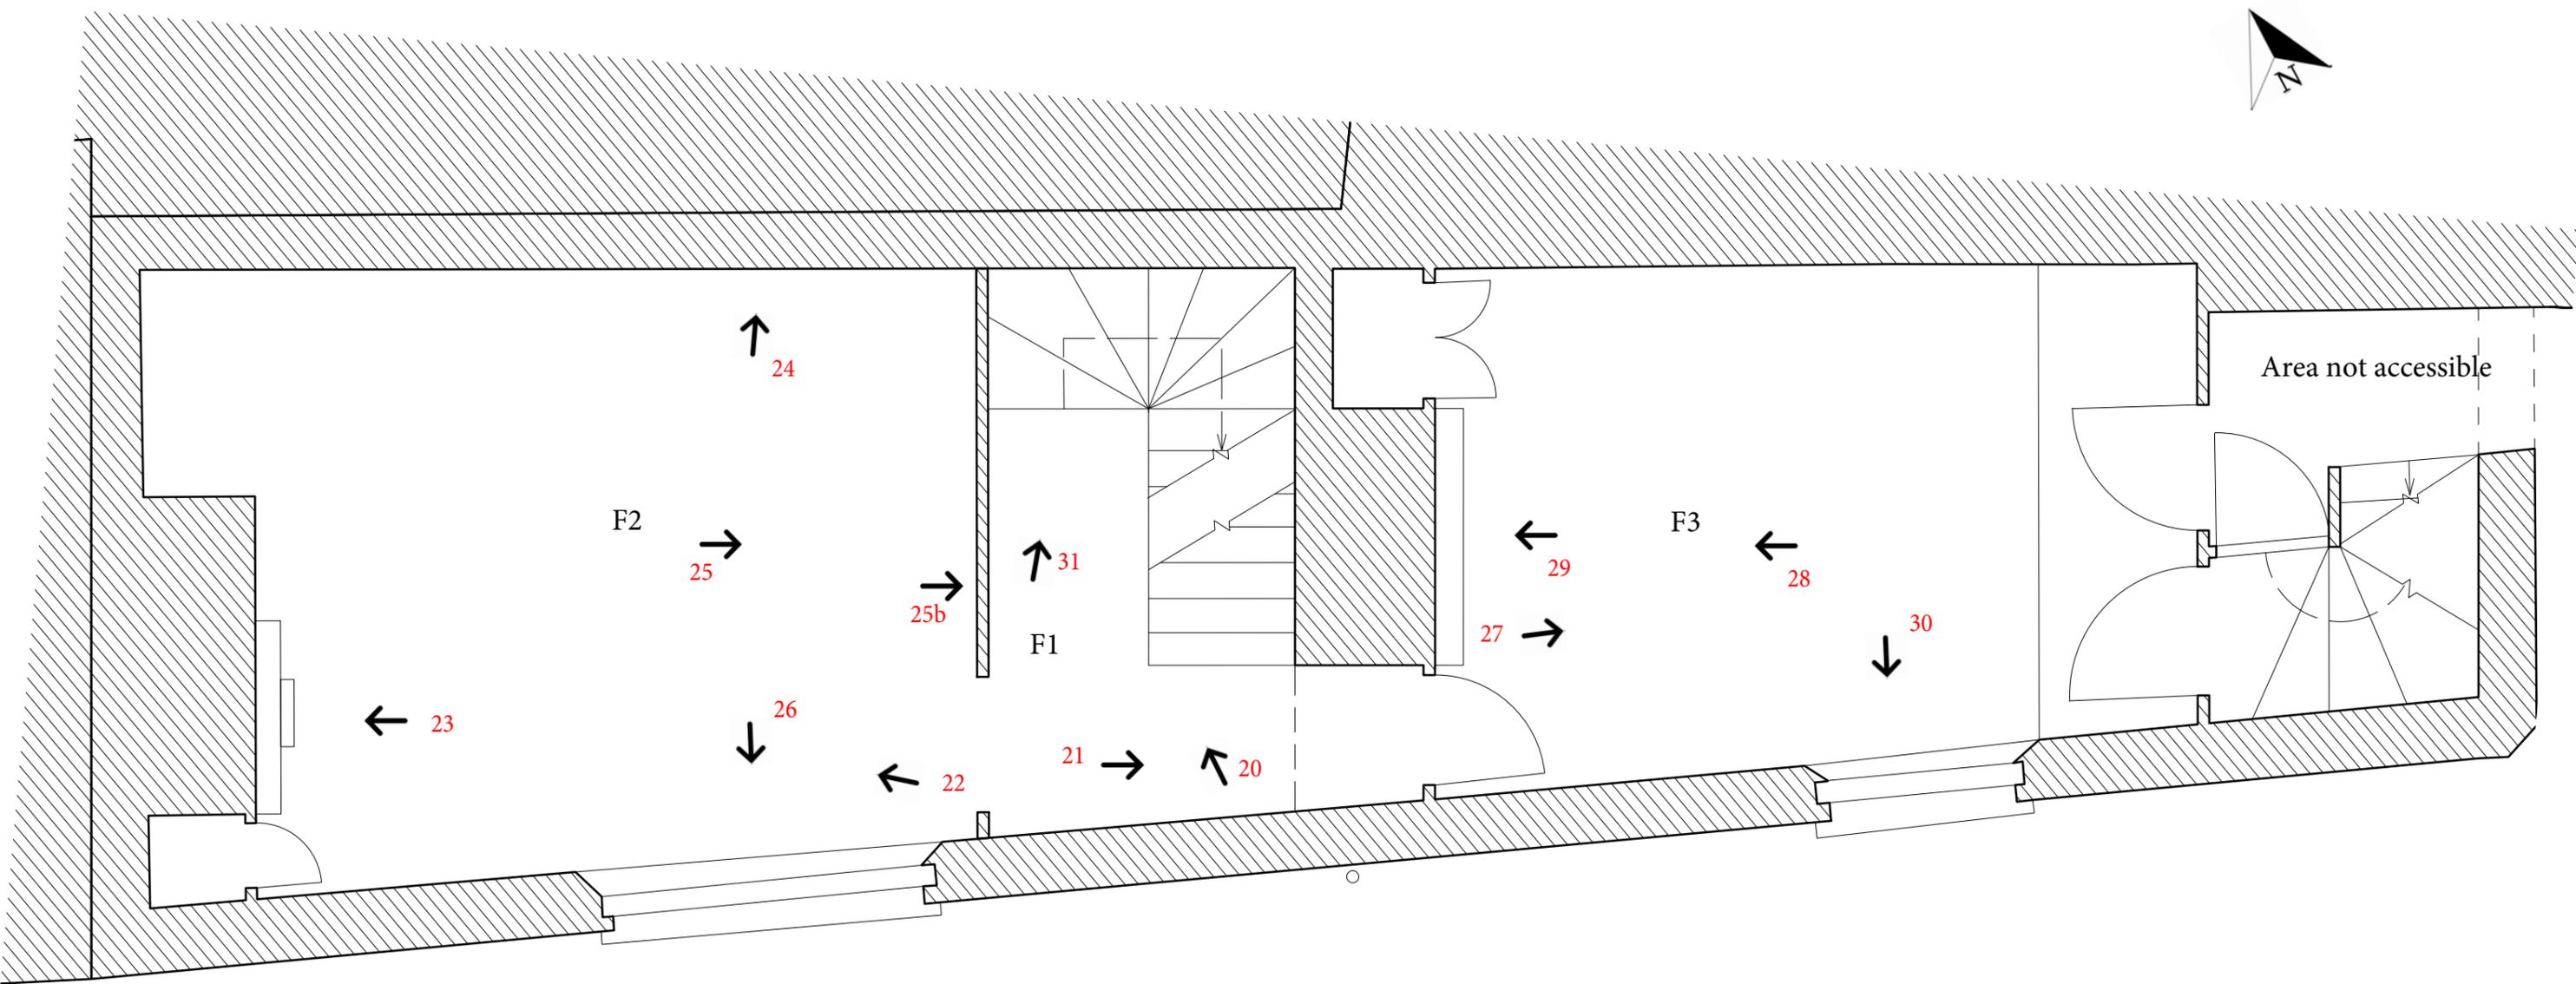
First Floor Plan showing room numbers and location of plates referenced in report (red)
